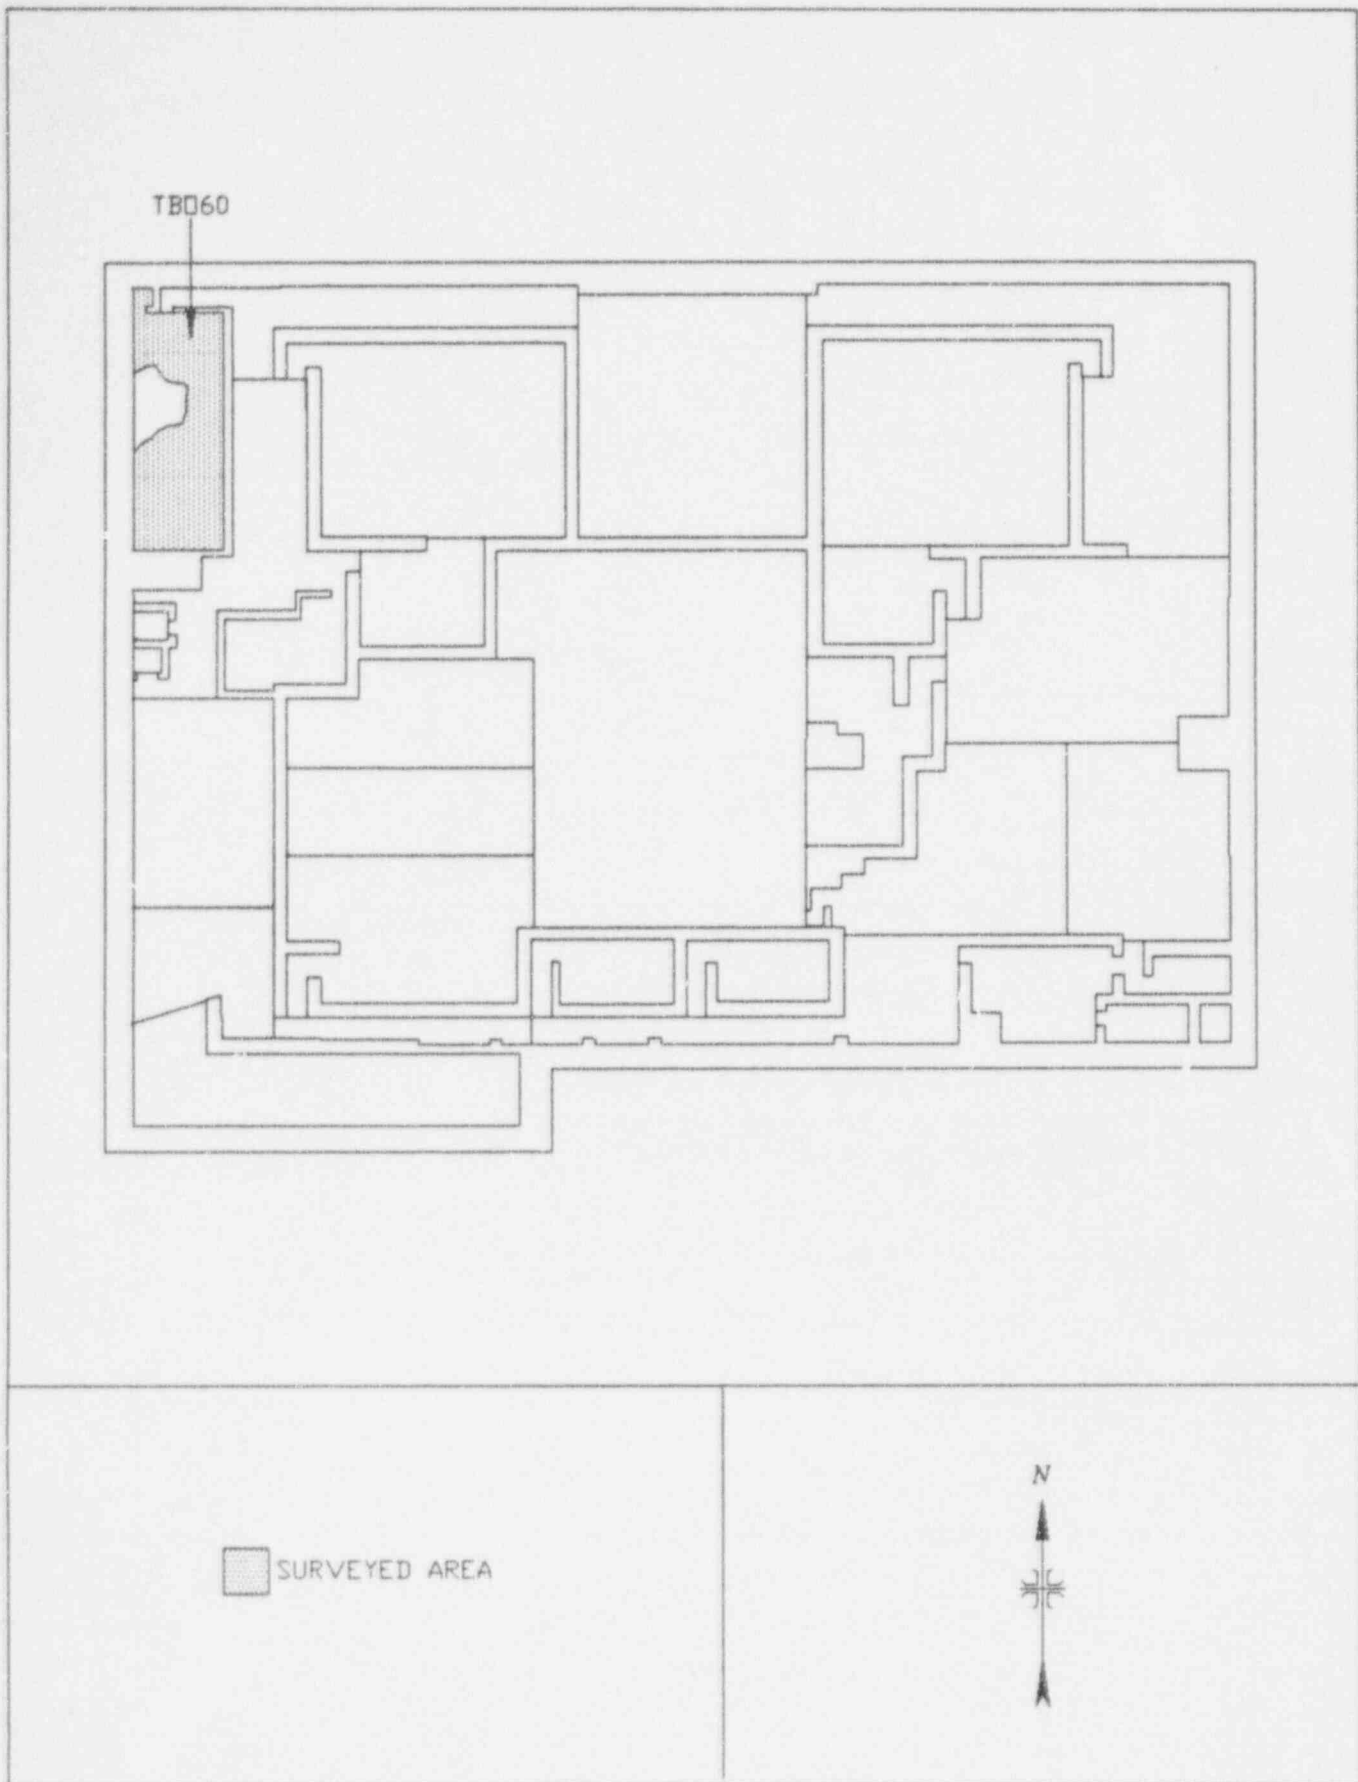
Turbine Building, Elevation 37'6" - Floor Plan and Areas Surveyed
